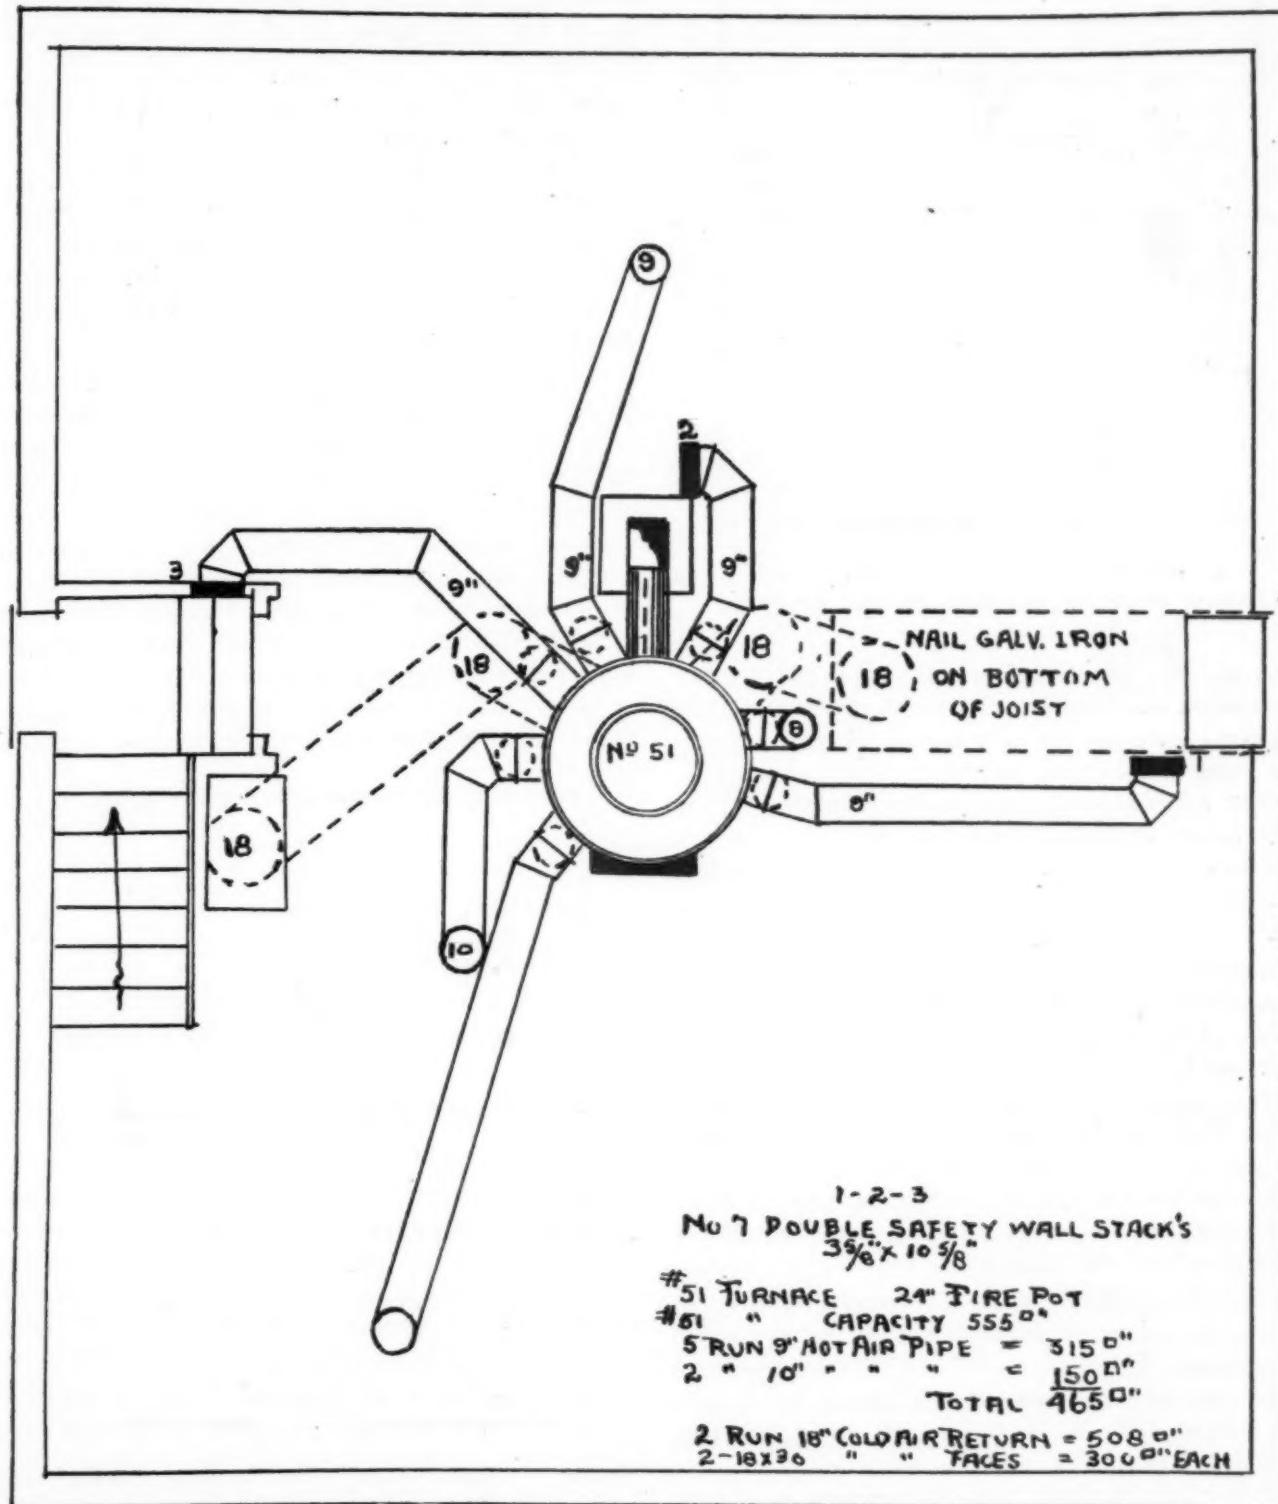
Showing Basement Plan of Warm Air Heater Installation in Houses for the Greater Garrett Improvement Company, Garrett, Indiana, Furnished Through Charles Schlatter, Local Installer of Victor Steel Furnaces.
